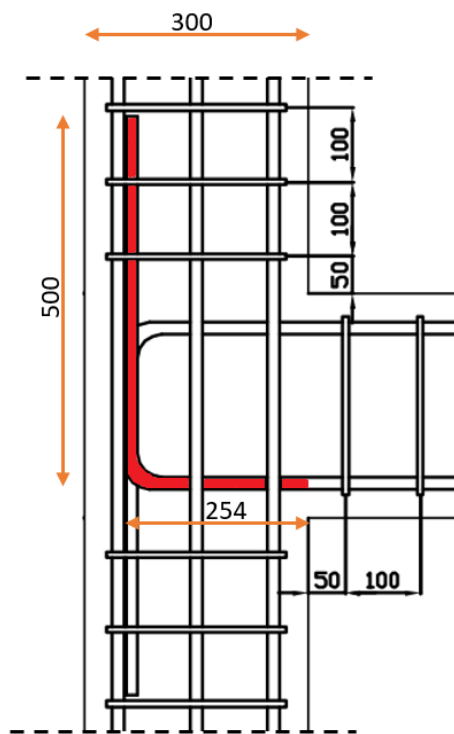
The detail of the anchorage length at the beam-column joint (units are mm).
